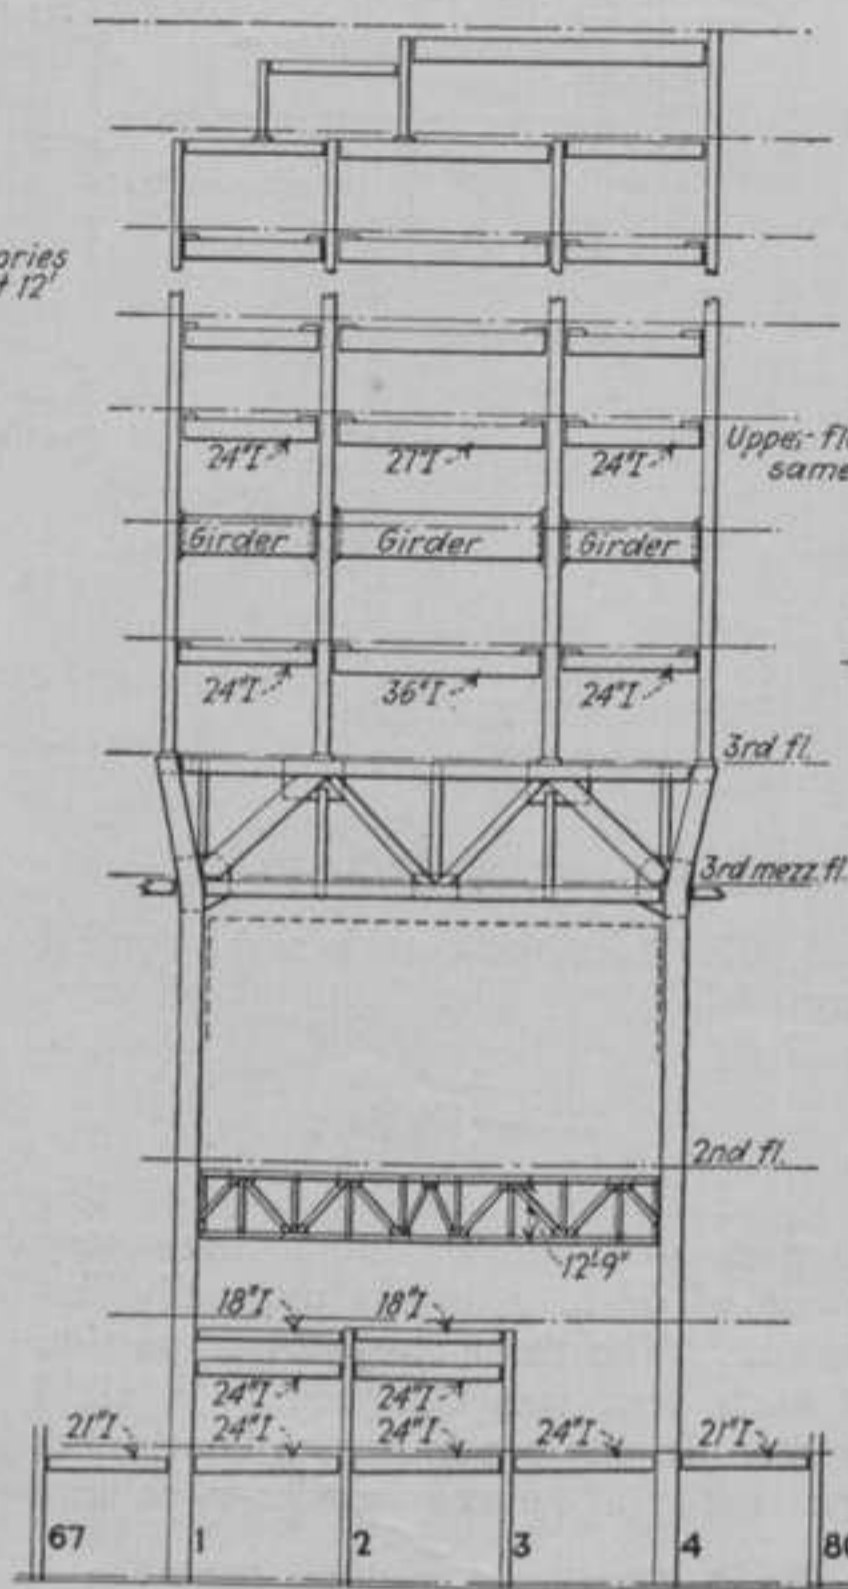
Complicated cantilever framing at the front corner supports the store fronts and the granite facing. The truss story is devoted to air conditioning equipment.
